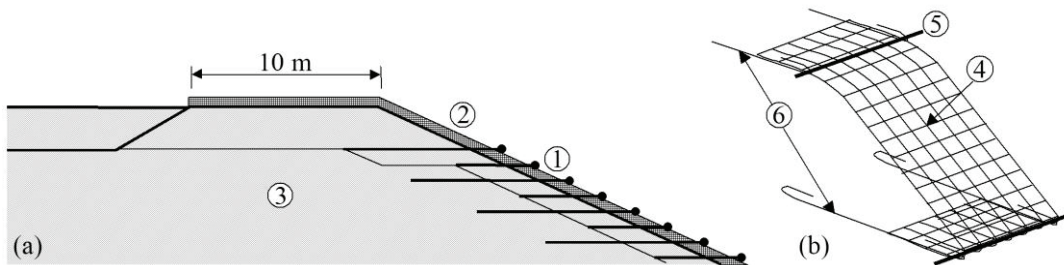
Protection by reinforcing slopes with anchored wire mesh including (a) ① steel bars 4 m and 10 m long, ② wire mesh, ③ riprap, (b) details of ④ wire mesh ⑤ thick steel bar ⑥ anchor bars (Schleiss, 2015)
